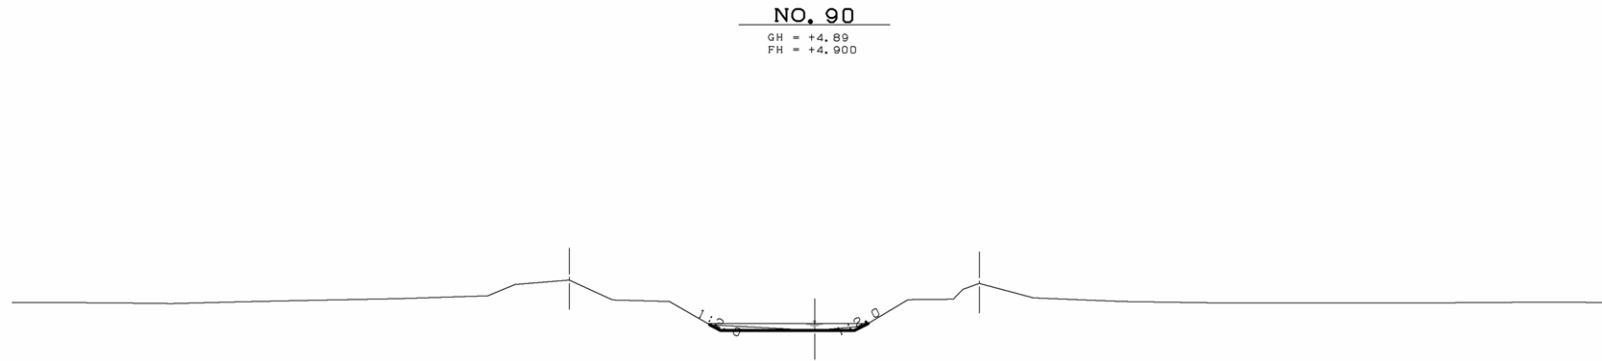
Typical Cross Section of Section (7) to (10) Existing Channel
